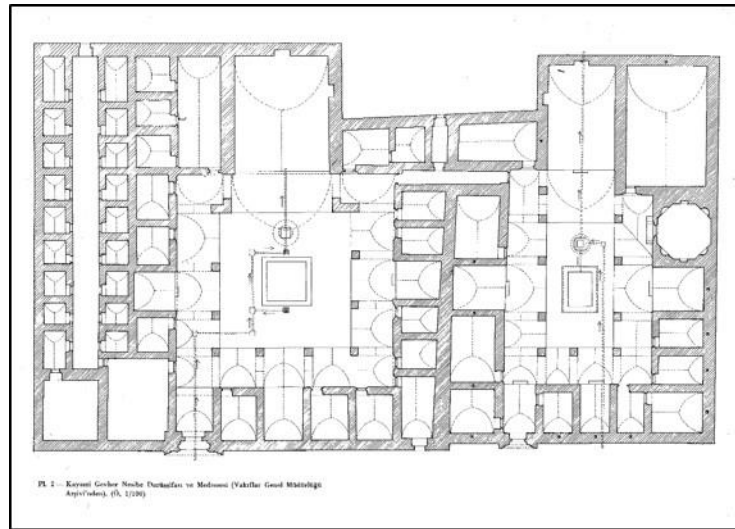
Gevher Nesibe Hospital plan, Cantay 1992, plan 2.
